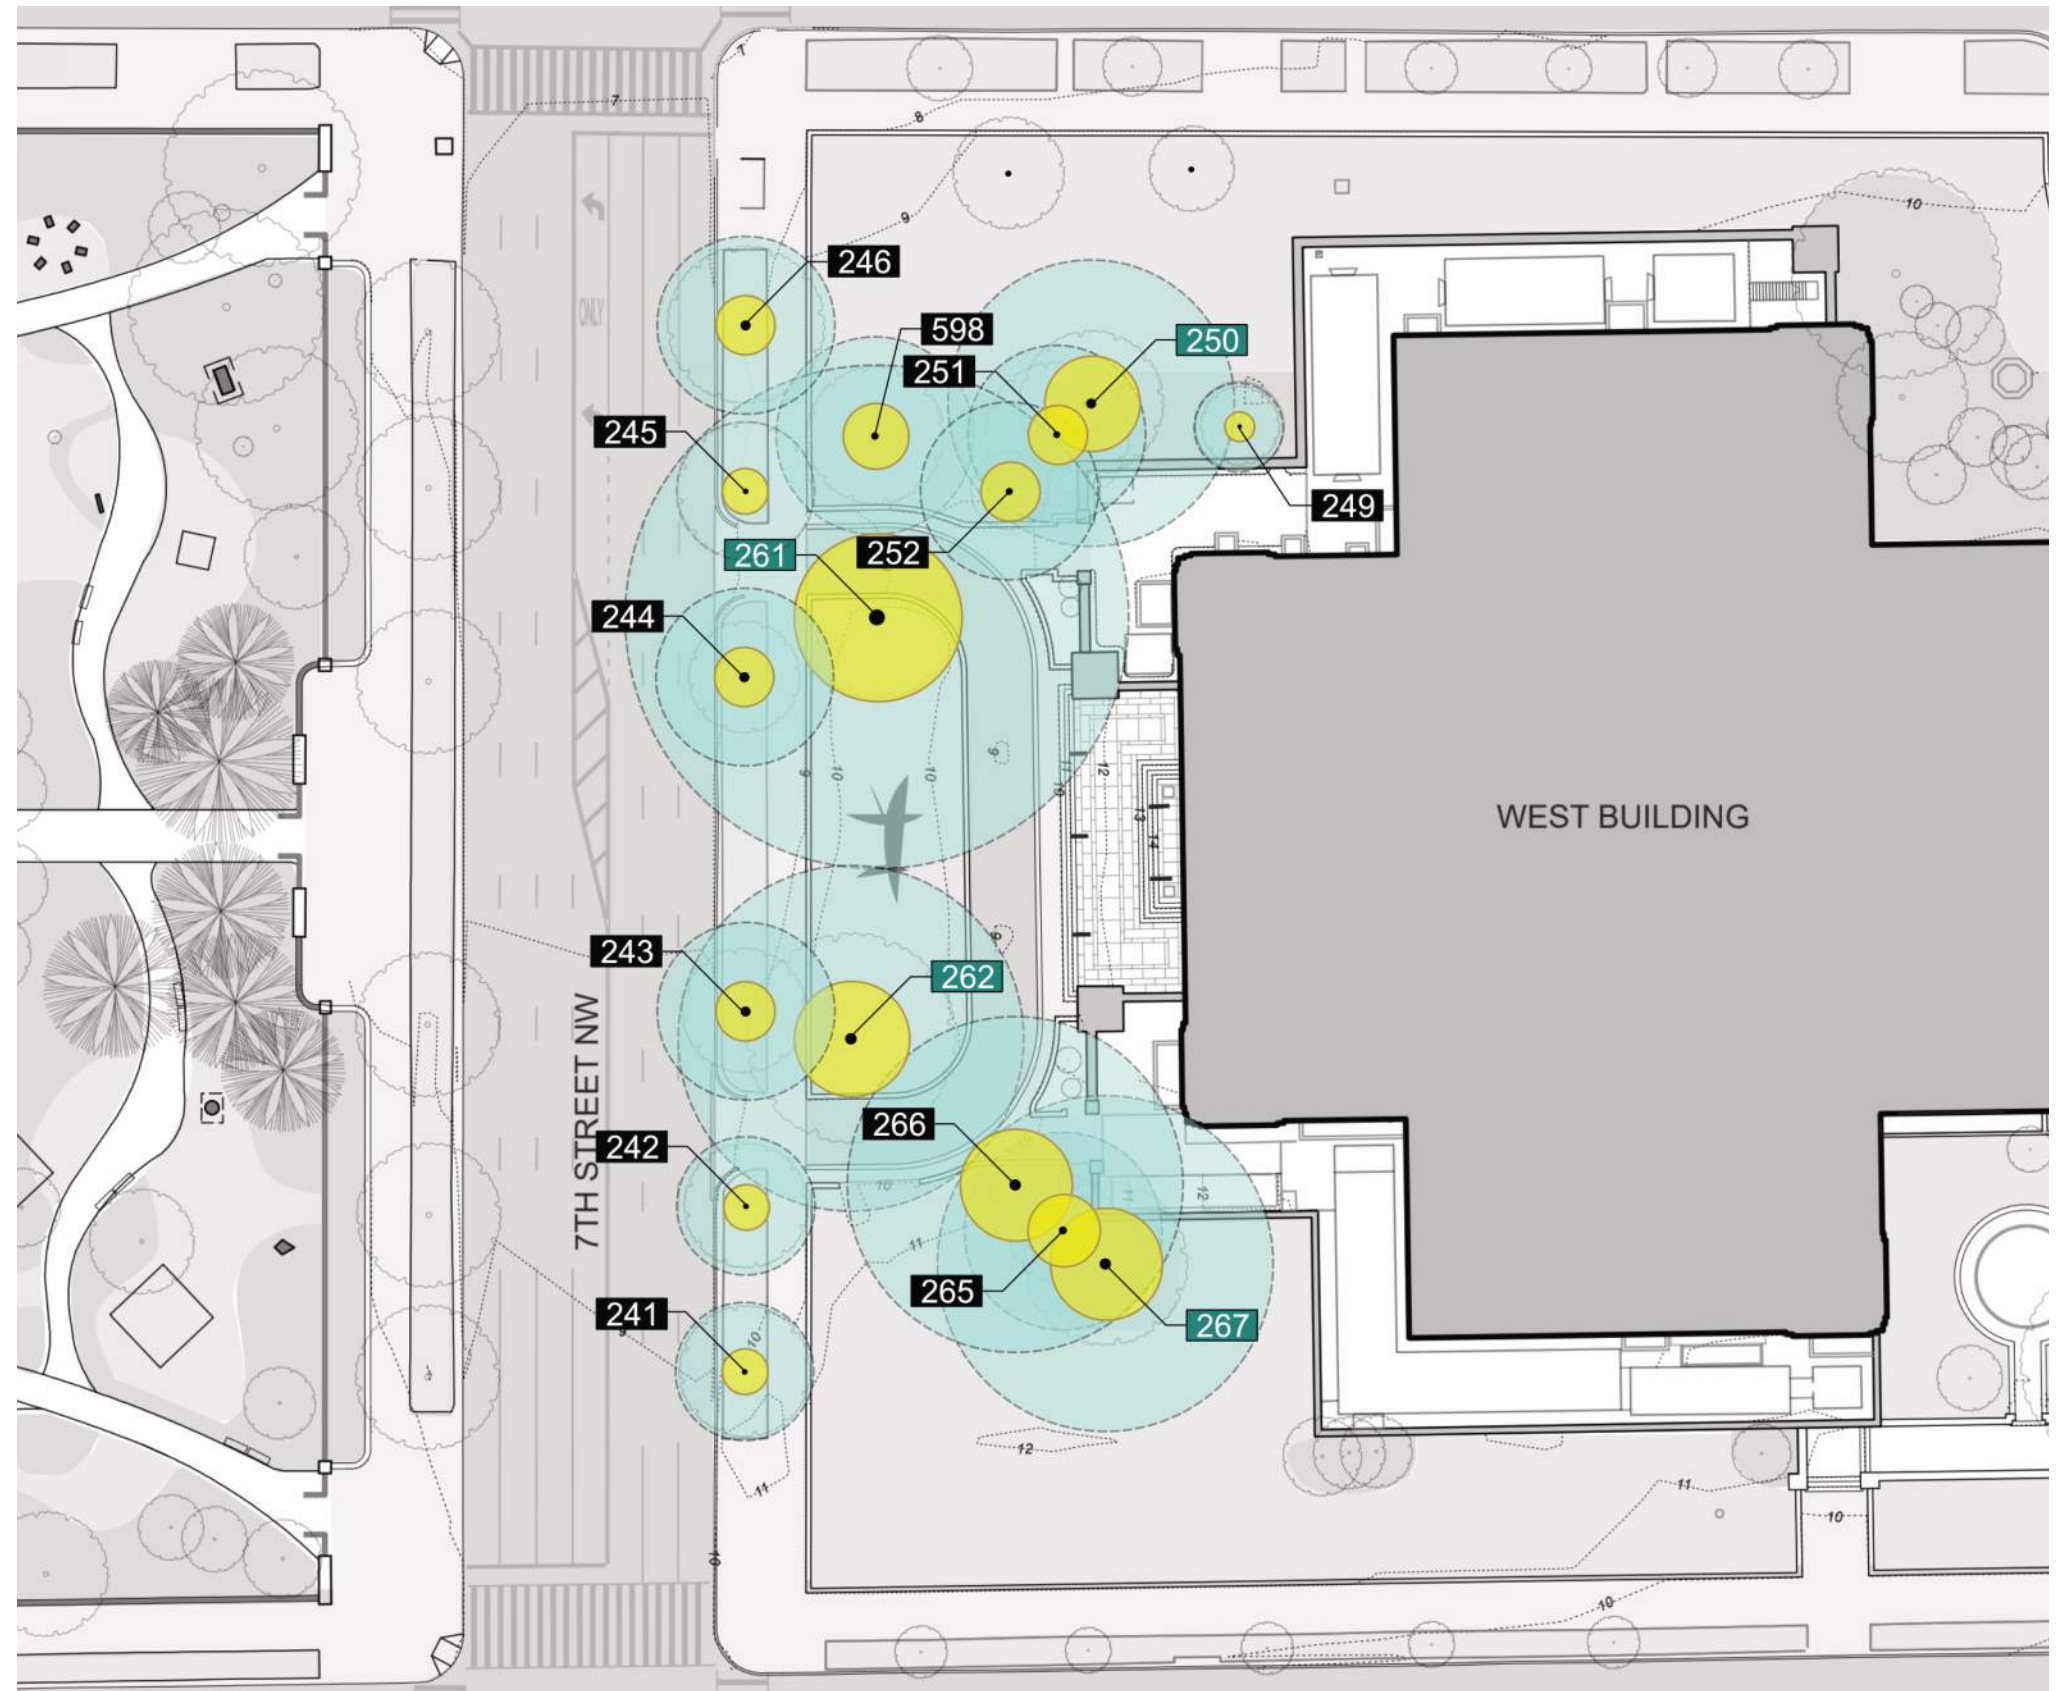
Site plan of existing trees at the Seventh Street Entrance.
